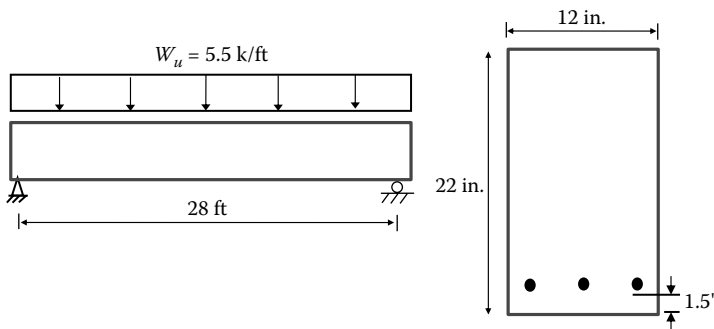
Beam profile and cross section for Example 2.3.
